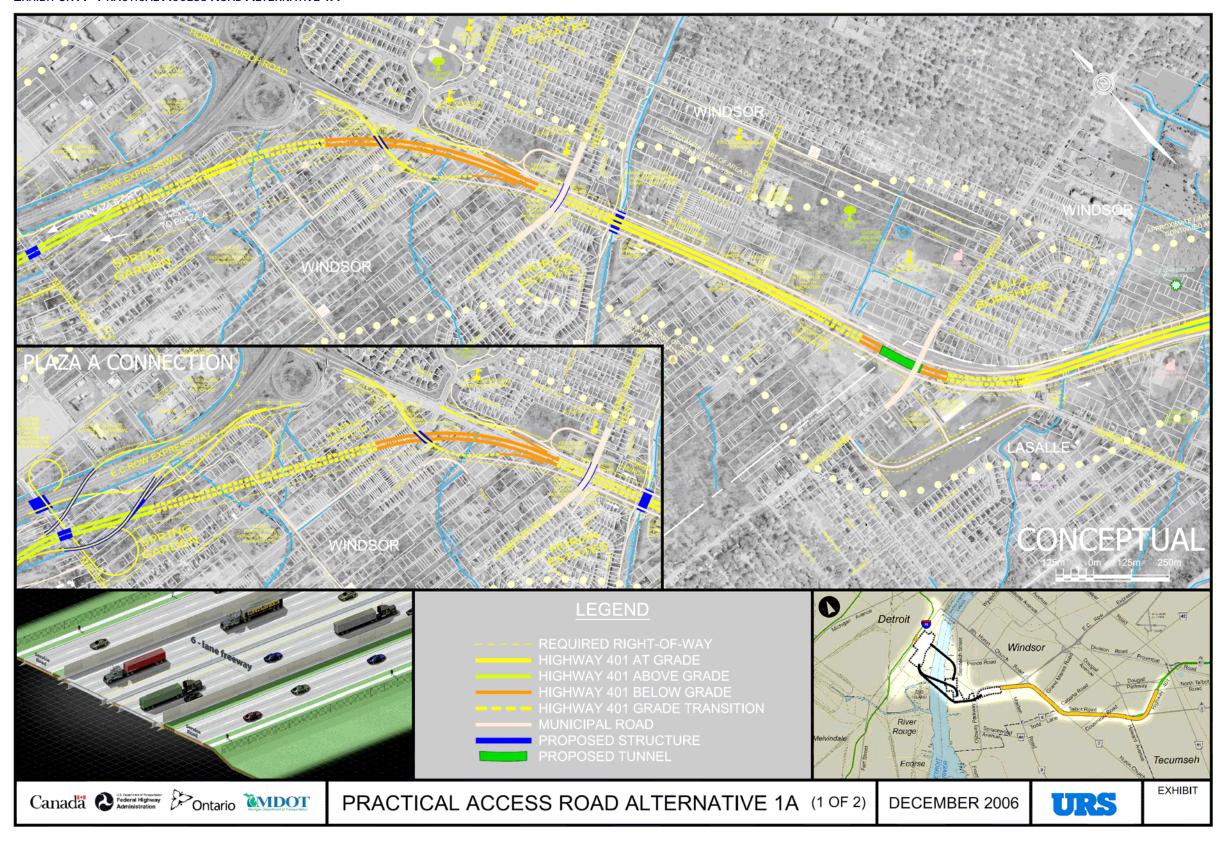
B- PRACTICAL ACCESS ROAD ALTERNATIVE 1A
